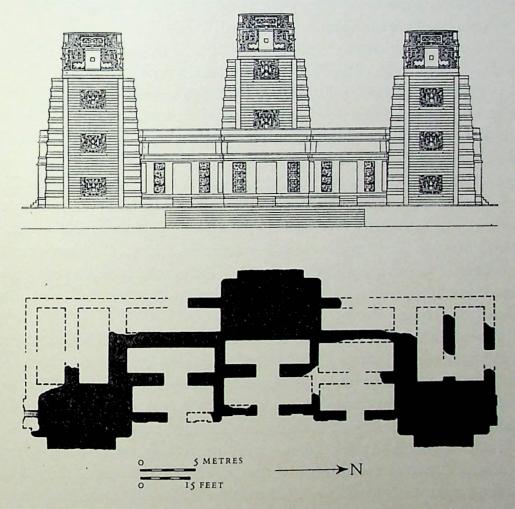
Xpuhil, Structure I, seventh century. Elevation and plan
